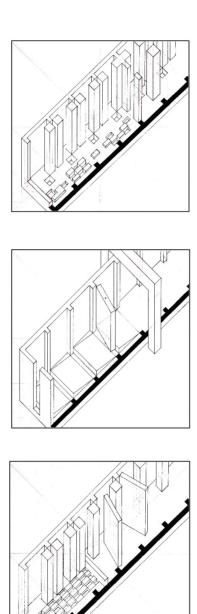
Examples of Axonometric Drawings. Courtesy of the author.
